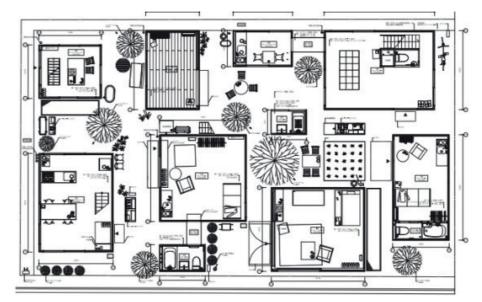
Ground floor plan, Moriyama house, SANAA (2005) • Source: El Croquis
